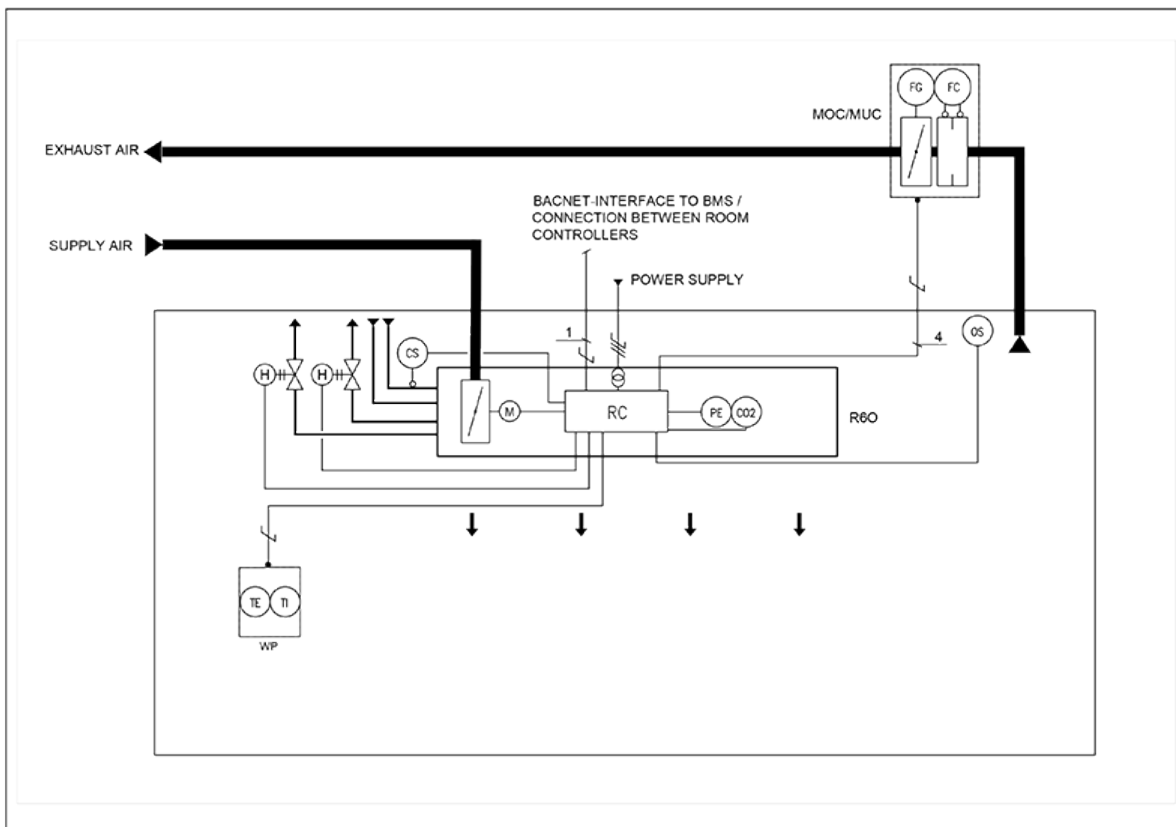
Schematic drawing: Halton Rex Integrated VAV (R60) chilled beam (4-pipe) controlled with Halton Workplace WRA room automation controller
